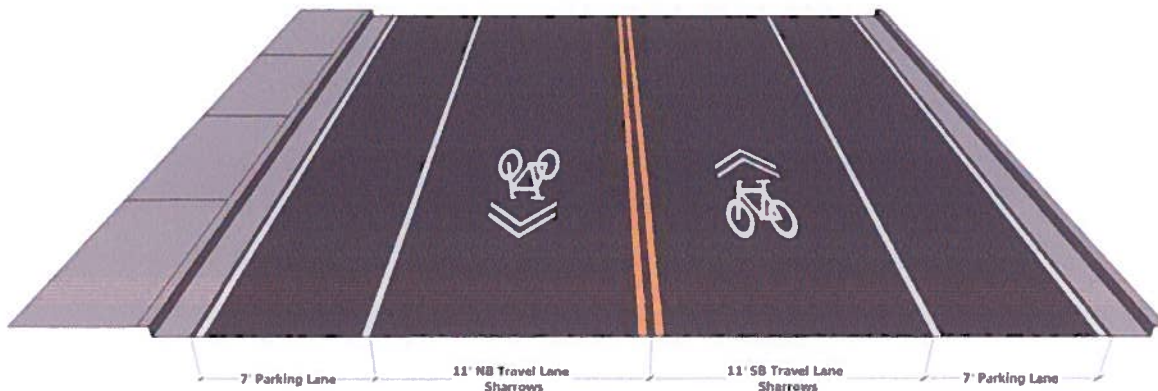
Recommended Marking – Ellison Street to Poplar Drive
